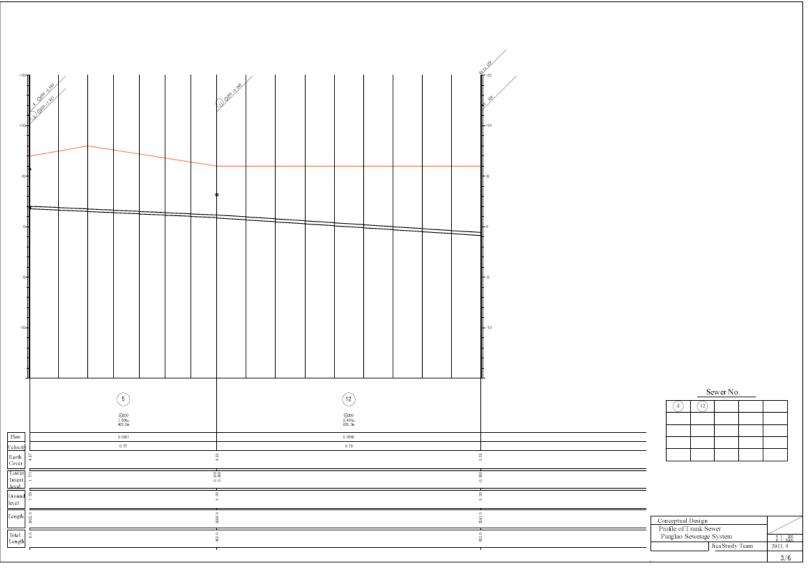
Profile of Trunk Sewer (Panglao Sewerage System)
